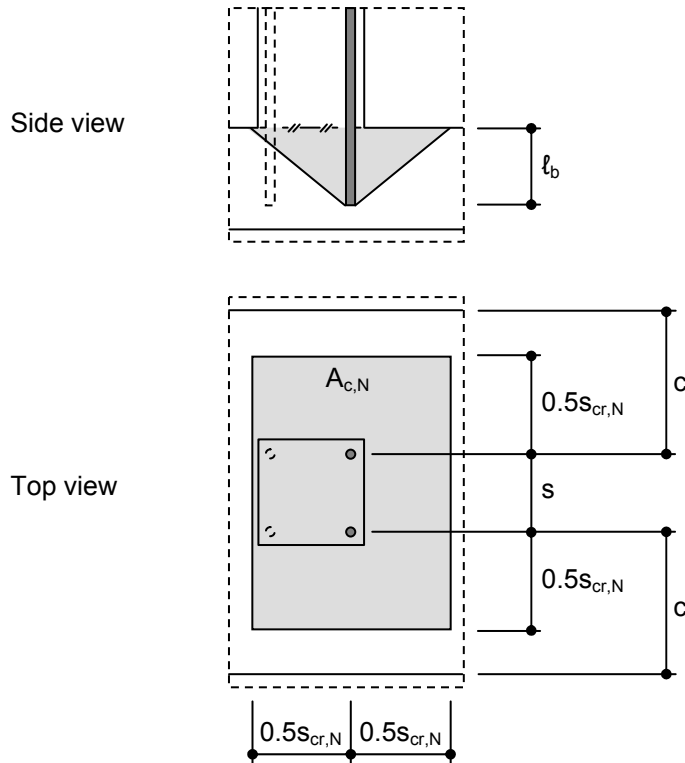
Idealised area  $A_{c,N}$  for linear arranged starter bar anchorages of column-to-foundation connections
